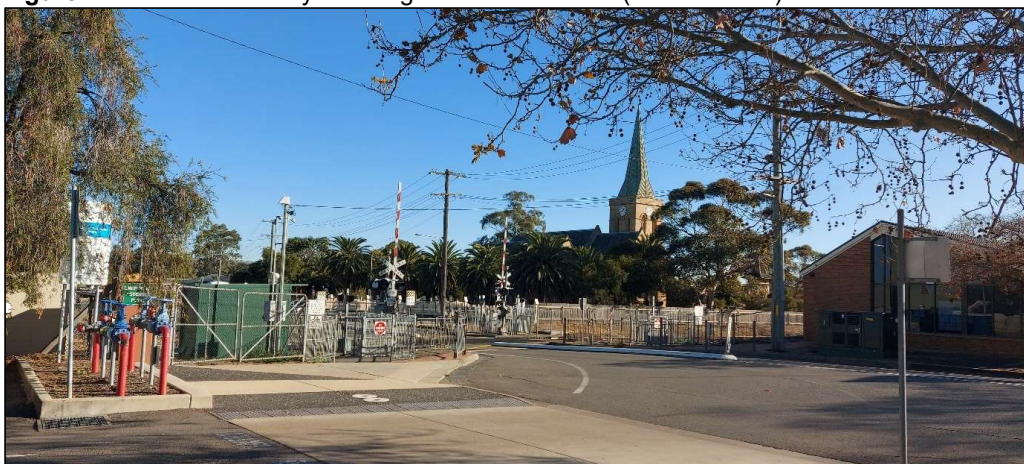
Surrounding development to north east of the site (Source: BRS)
